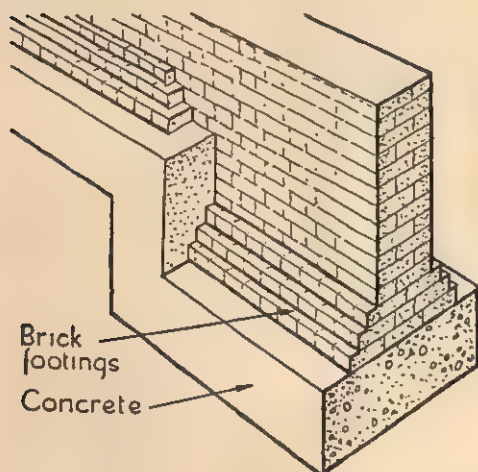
Foundations in sloping ground. In order to show how the wall rests on the concrete base, the walls of the trench are not shown
